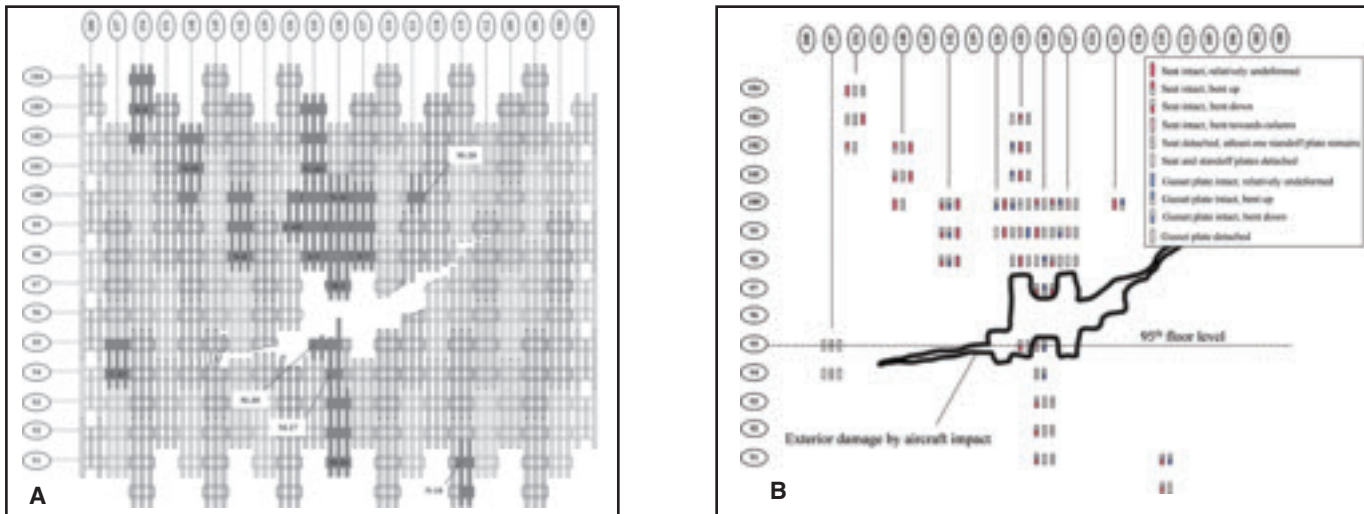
A — Damage diagram of WTC 1 north face showing the location of recovered exterior panels; B — observed condition of recovered floor truss connection; those at or below the 95th floor level are either missing or bent downward.
